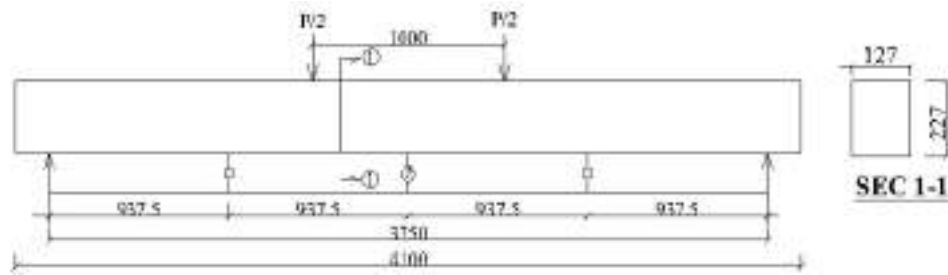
Loading arrangement for all beam specimens. (Source: Pansal et al., 2006).
